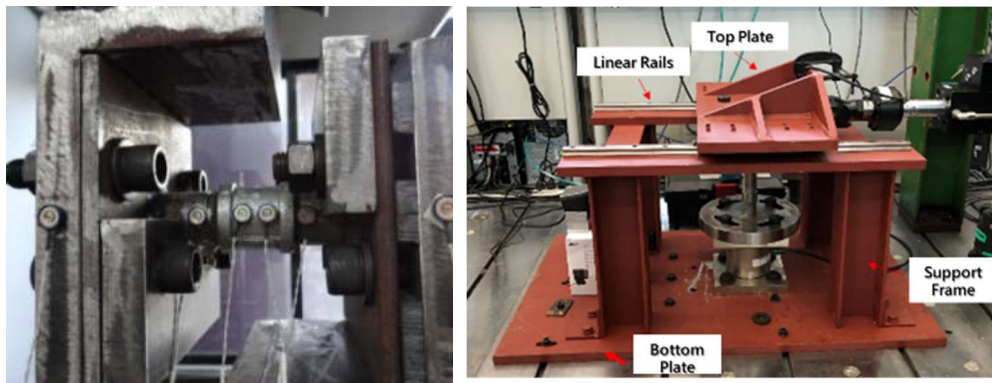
Bending-shear test on fire-protection piping joints (left) and shear test on 1-inch hose (right)
